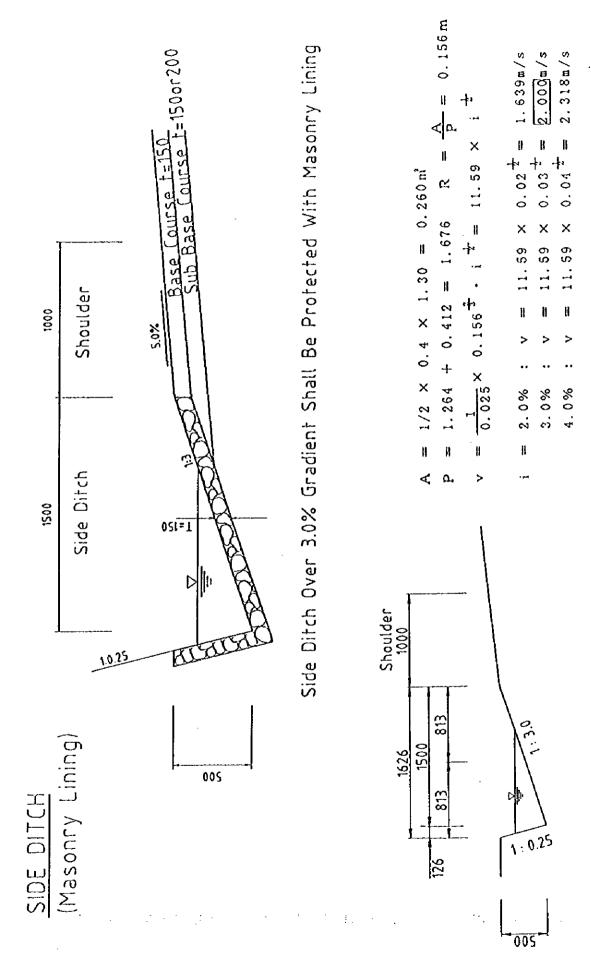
TYPICAL CROSS SECTION OF SIDE DITCH
